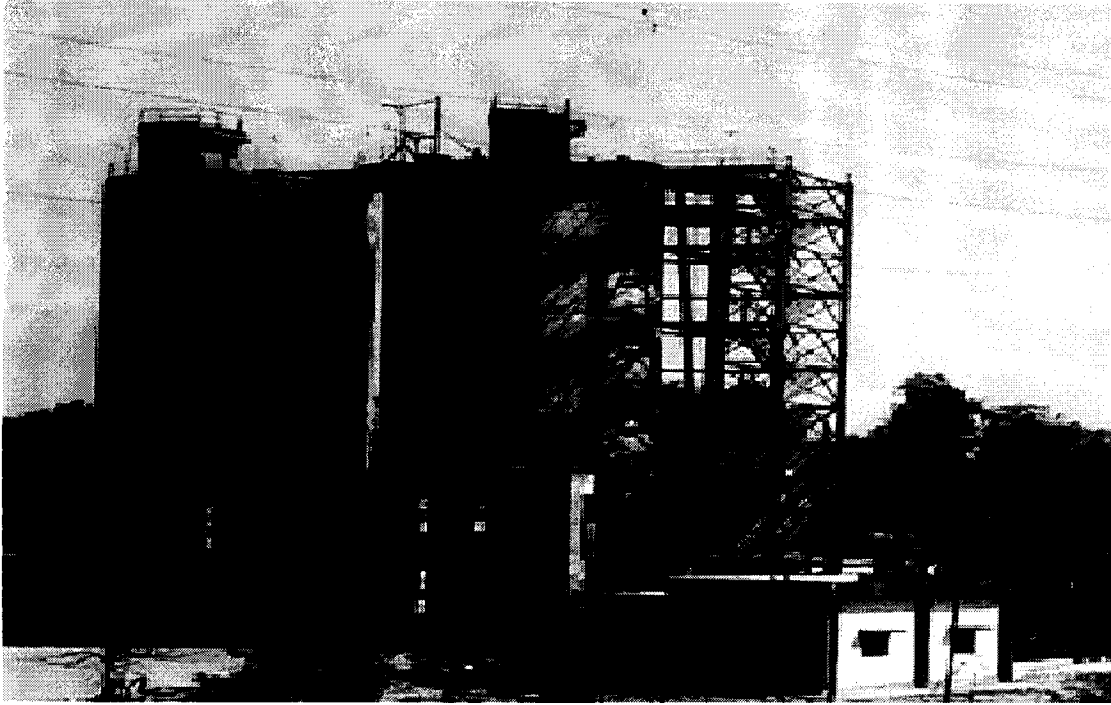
Silos under final stage of installation for dry ash collection of M/s CSEB (expansion project)
